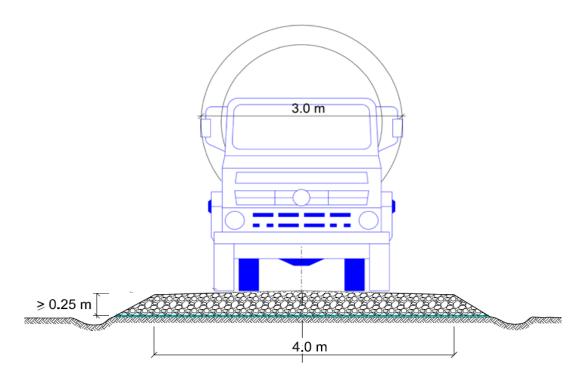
Dimension for concrete pipes transport for TAP microtunnel
